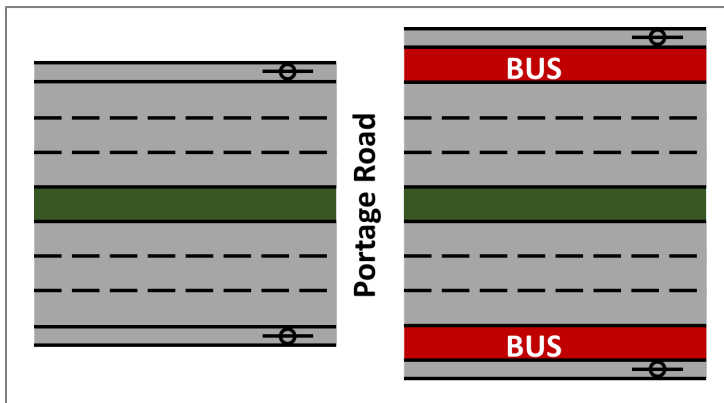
East Washington Running Way Between Mendota Street and East Springs Drive
